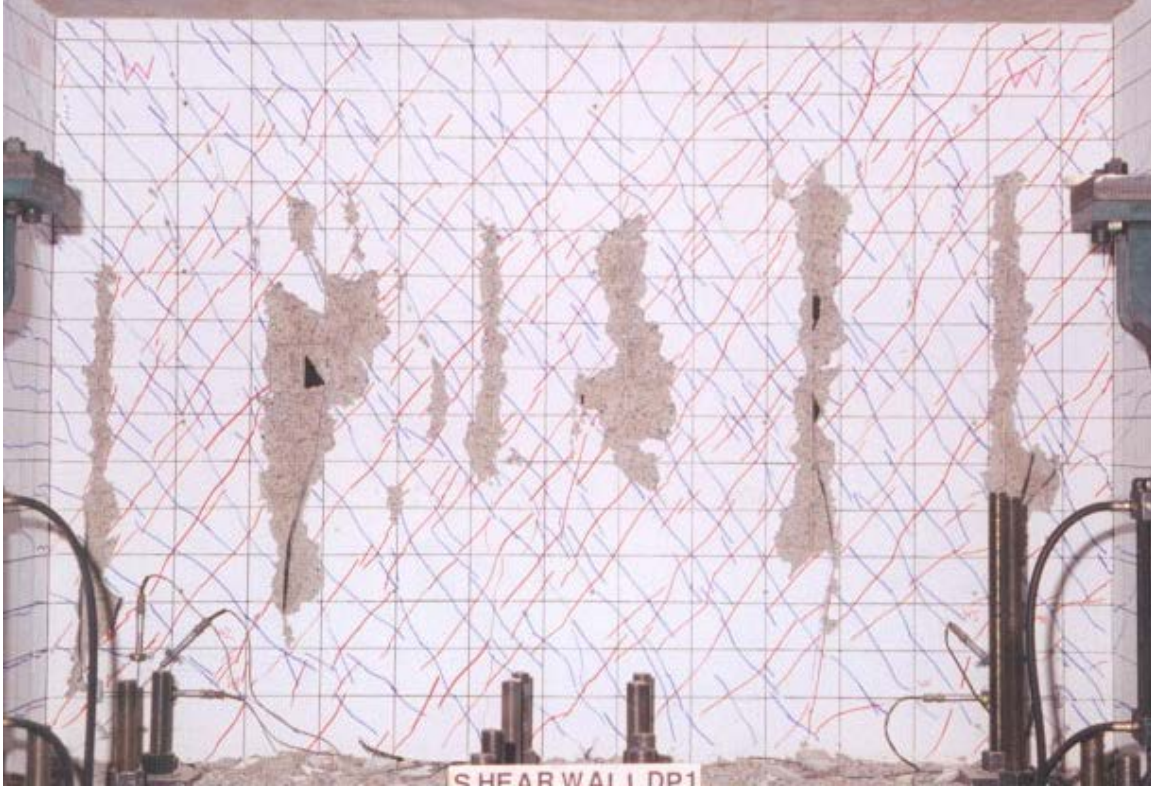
Crack pattern and damage sustained by the web of Palermo shear wall DP1 at the termination of the test (Palermo, 2002)
